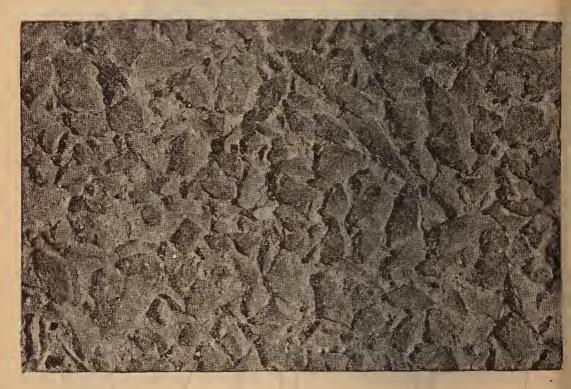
Surface of Broken Stone Concrete after being Washed.
